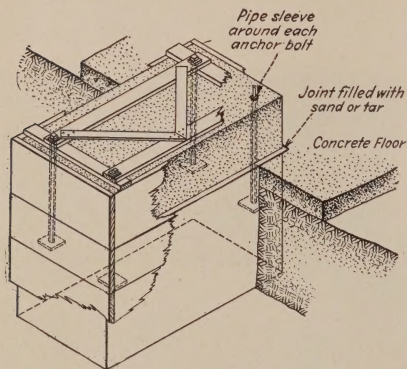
Method for locating foundation bolts in a machinery foundation. Joint between foundation and floor prevents vibration being communicated to floor.
